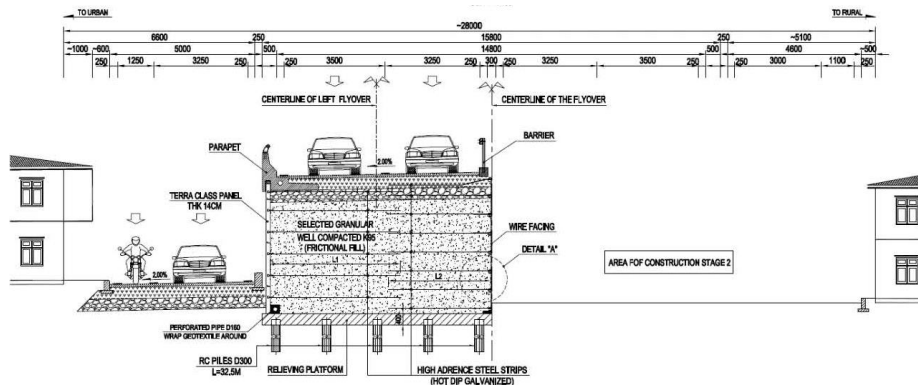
Section of stage 1 of a two-stage construction of Reinforced Earth
